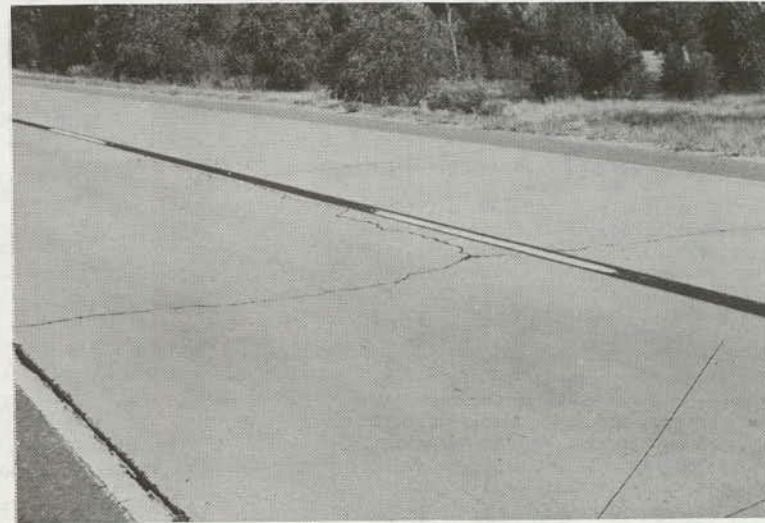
Cracking from Improper Joint Construction (cracking is at a location where a joint should have been saw-cut).
